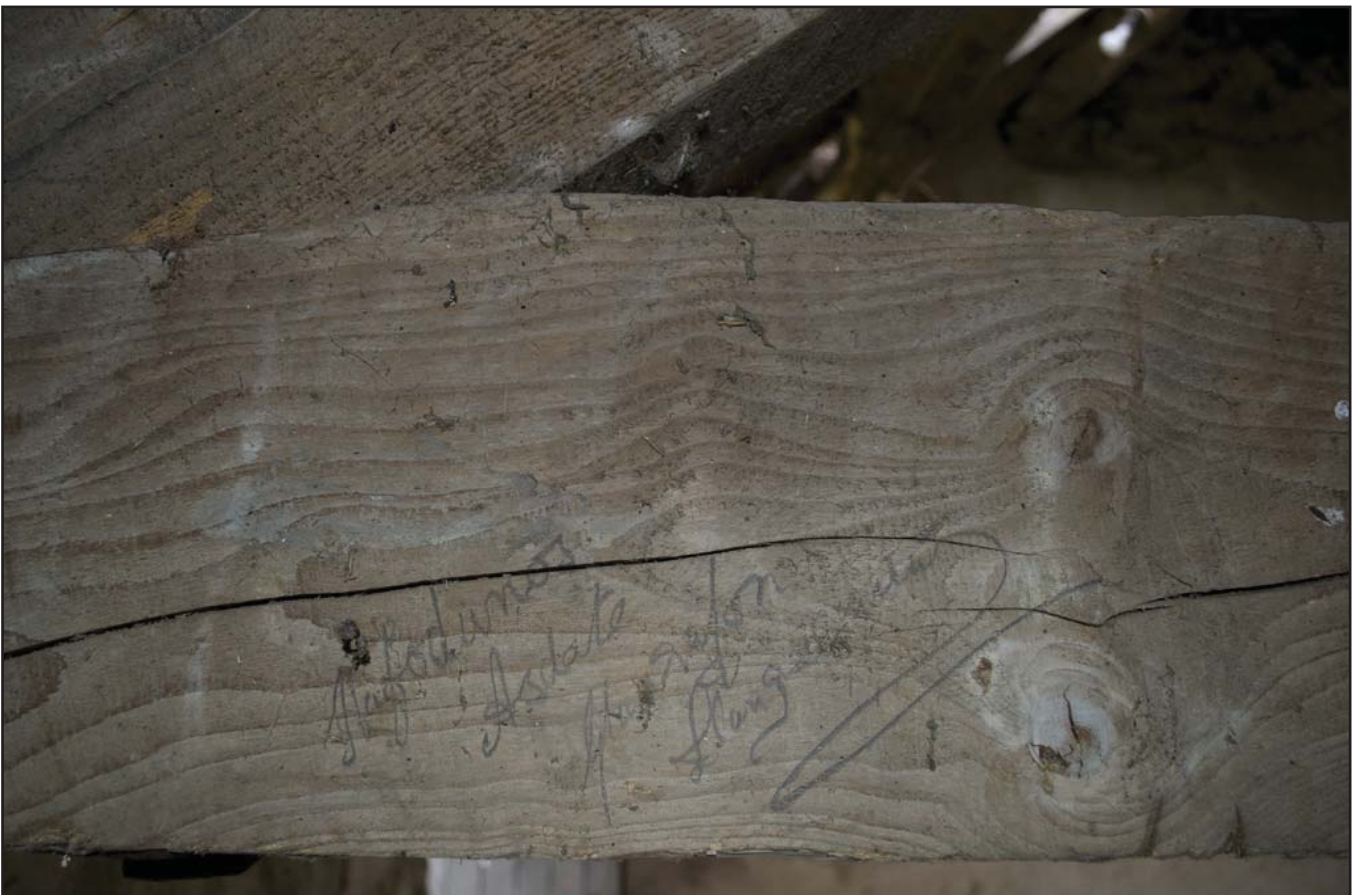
Example of graffiti from SW elevation of roof truss of Grain Store F04 - upper floor - (internal) (archive reference: G2479\_023).
